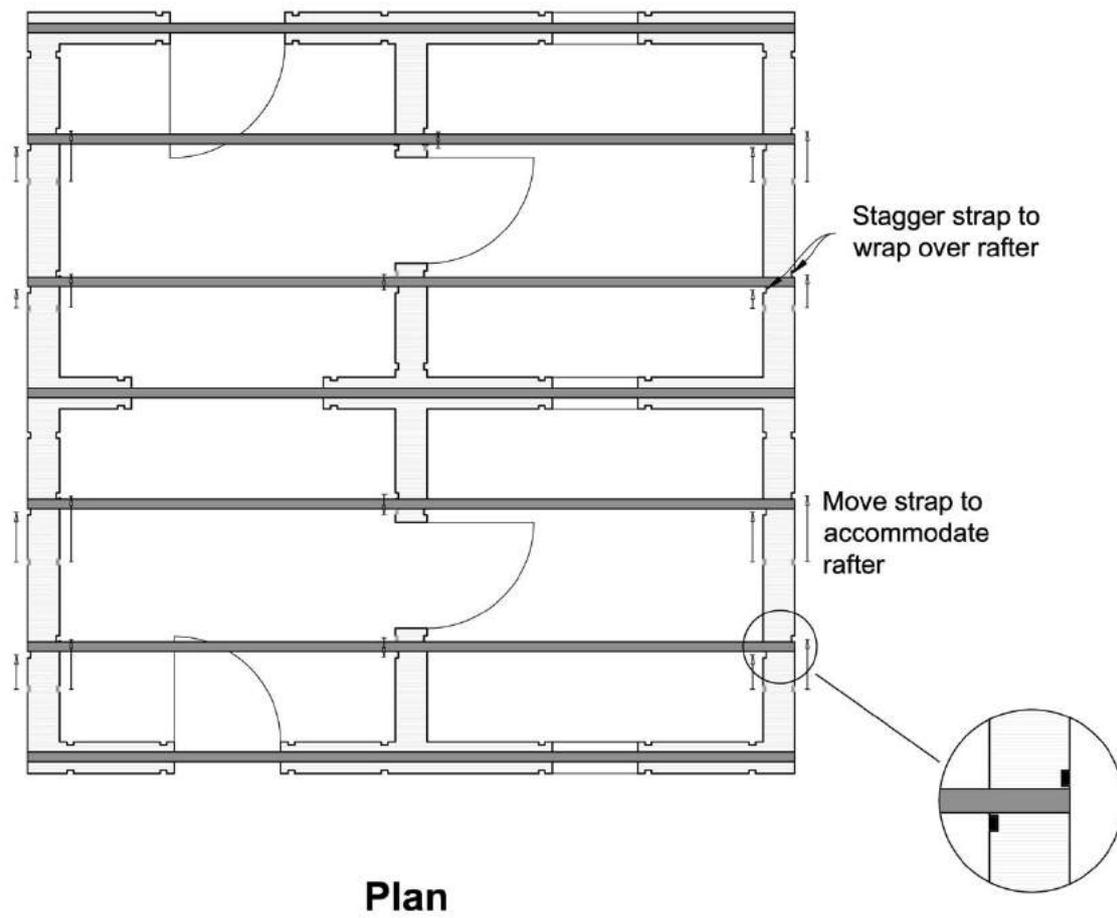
Plan of a house with walls and rafters shown. Straps need to be positioned under rafters where ever possible, and then off-set or staggered so they rise vertically up the wall and wrap over the rafters.
